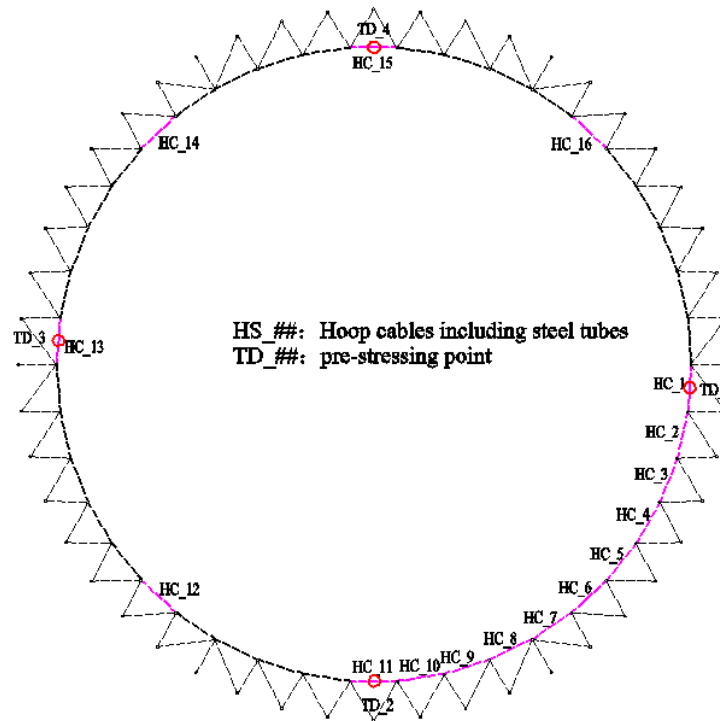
Arrangement of tensioning devices and hoop cables, including steel tubes
